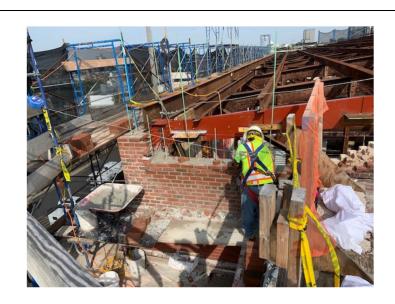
Facing south, Bunlin LLC continues masonry work and wall construction at the boiler house superstructure.
